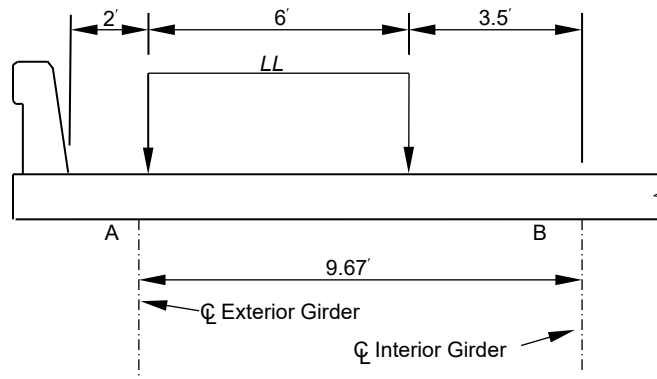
Lever Rule Example for Exterior Girder Distribution Factor
